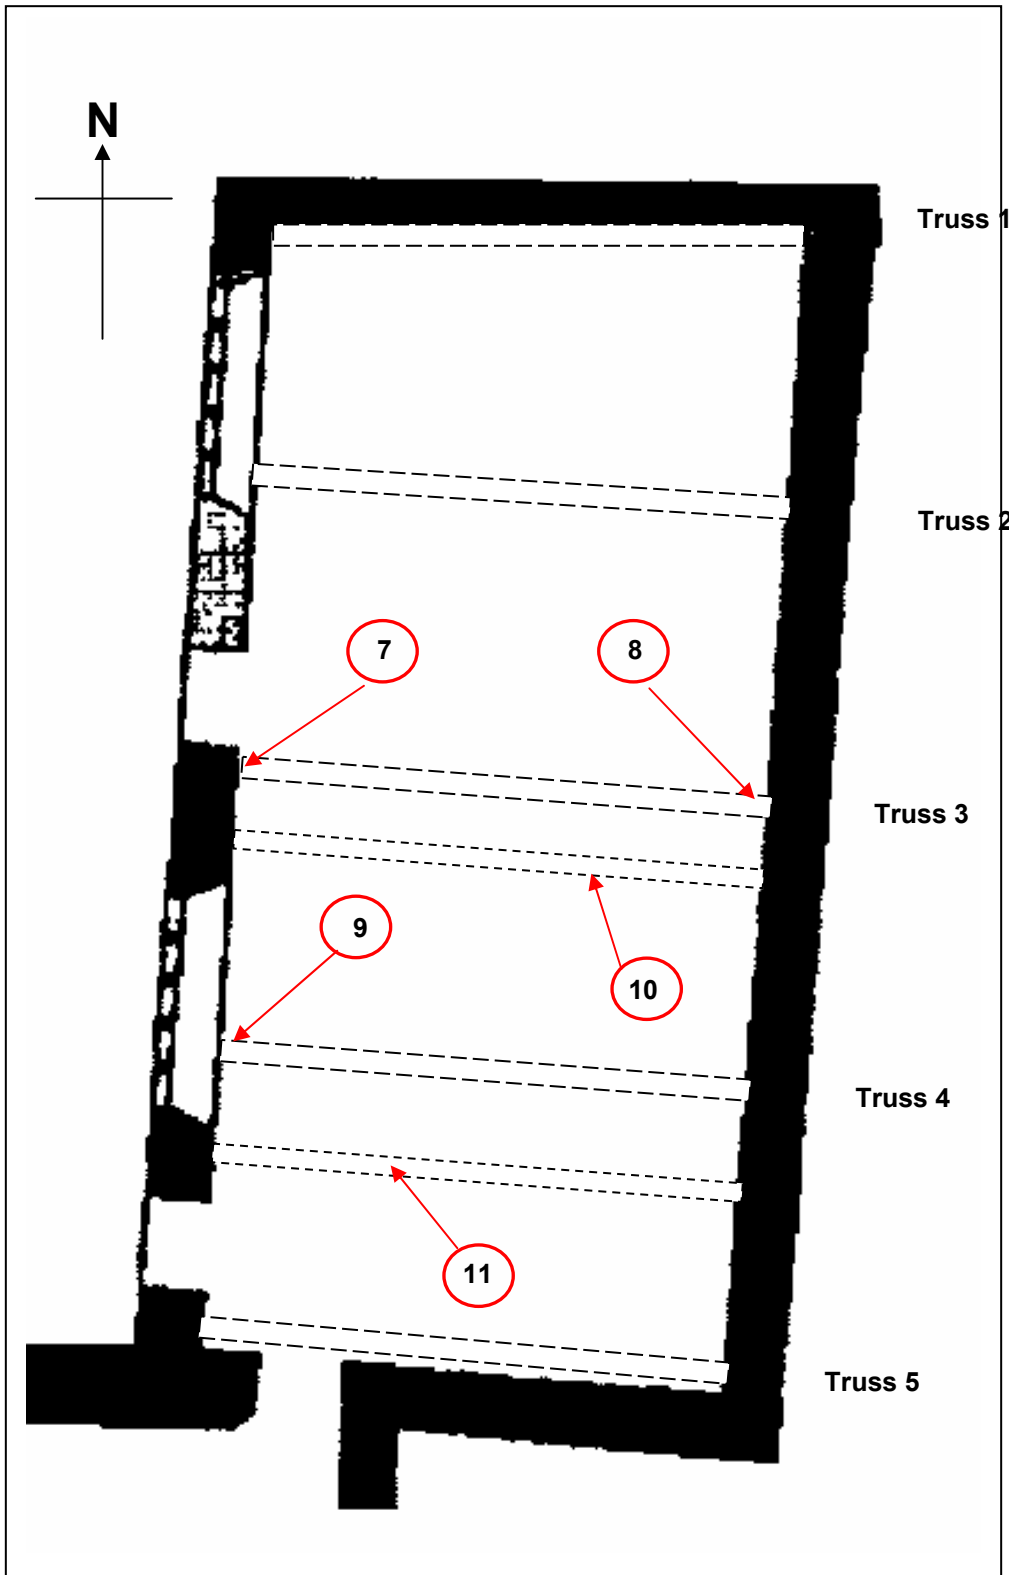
The cider house; plan to show approximate location of sampled timbers
